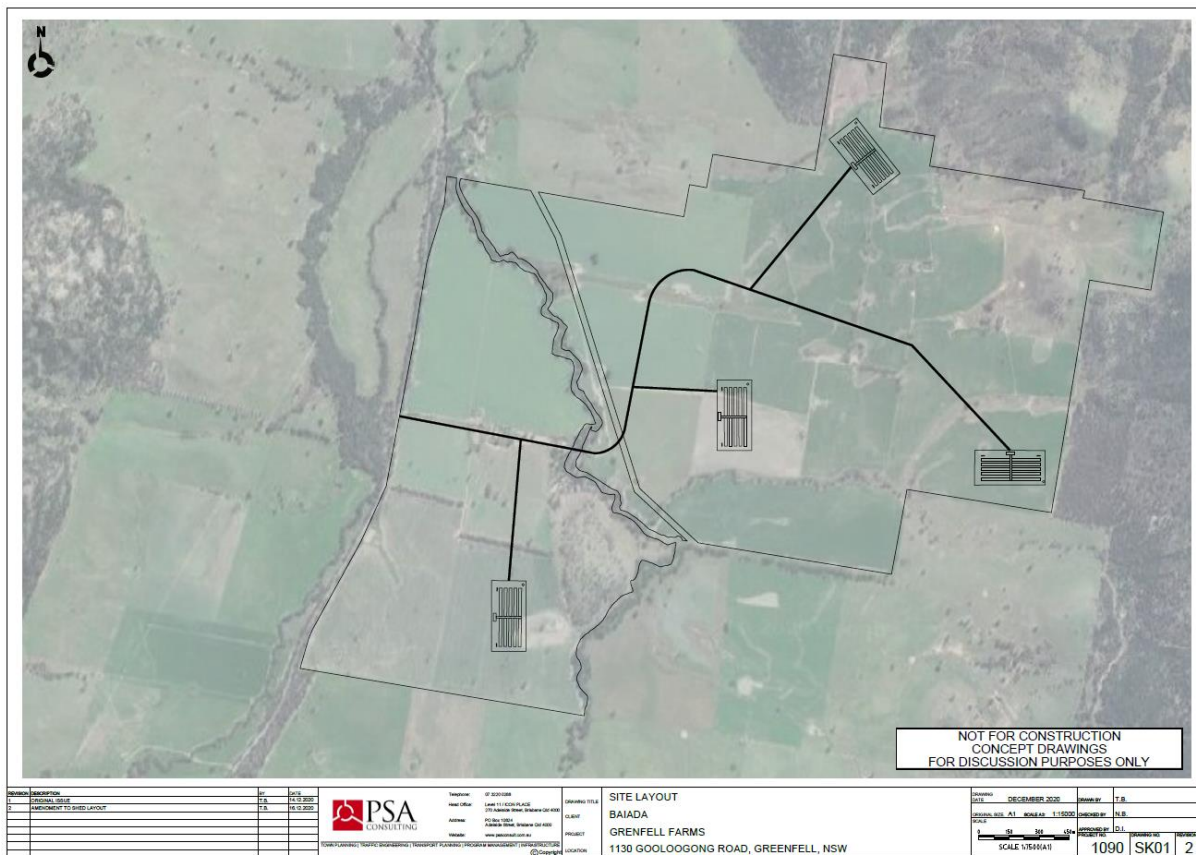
Conceptual site layout (PSA Consulting, 2020)
